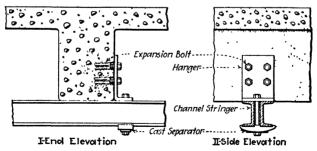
A method of fastening double-channel stringer to a concrete beam with expansion bolts.
